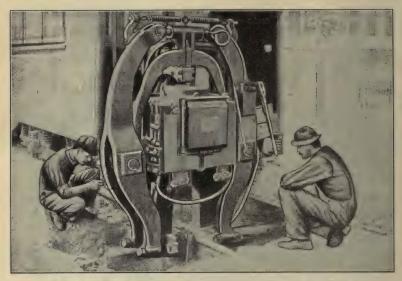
Electric Welder welding the Joints in Street Railway Rails.
